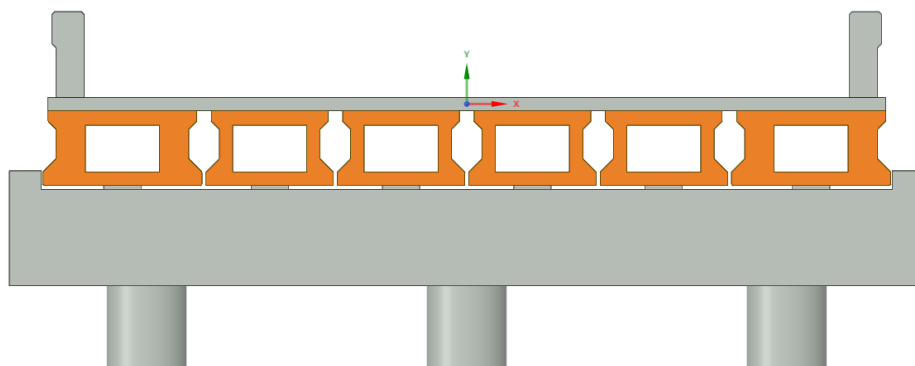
TxDOT 24-ft roadway box beam bridge
